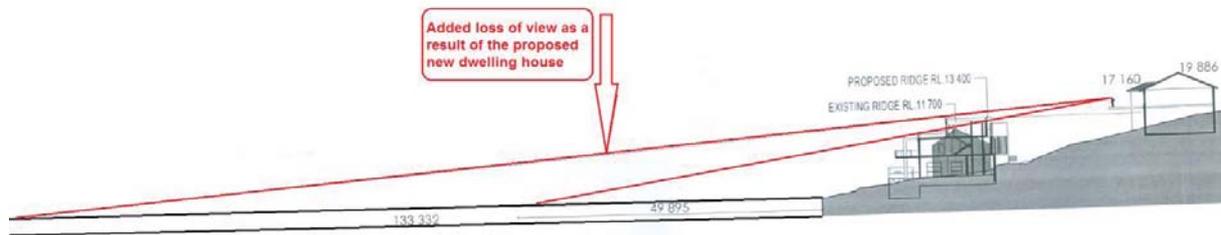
Section demonstrating added loss of water views from No.135 Tennyson Road
